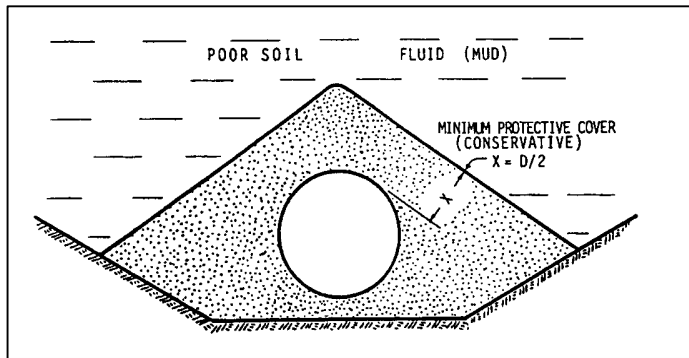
Minimum cover of embedment over a pipe in either an embankment or a trench with sloping walls in poor native soil.
